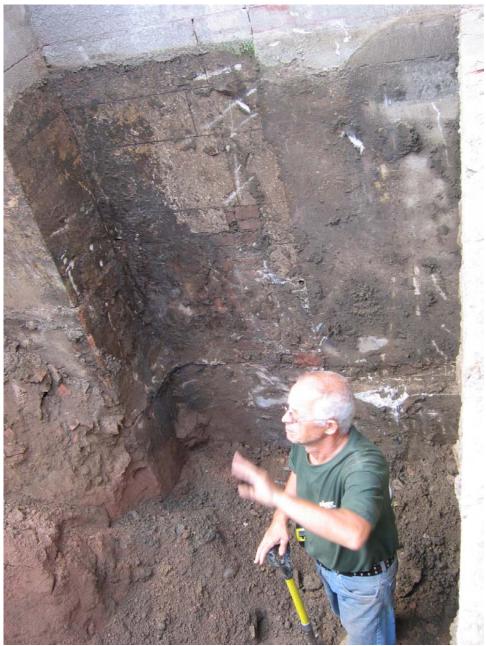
Columbus Park Pavilion - ADA Ramp Area
